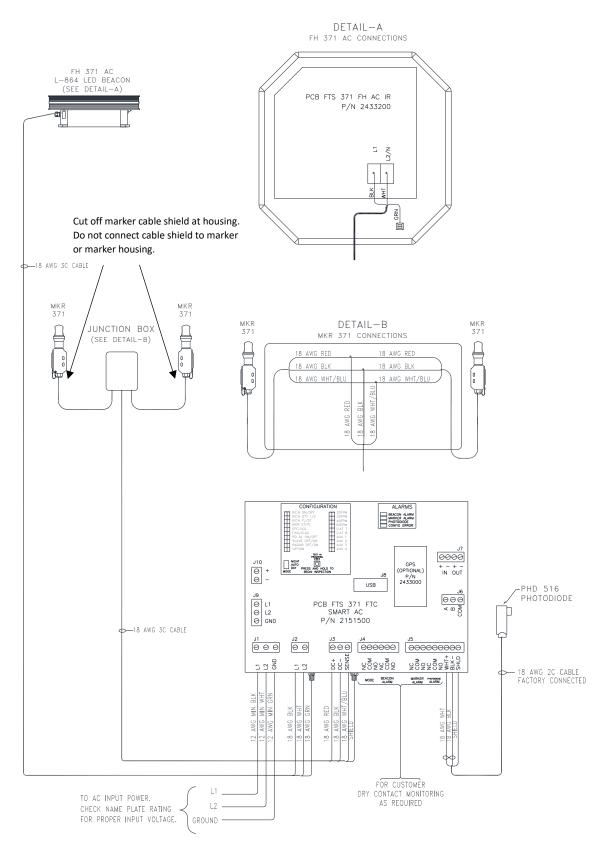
FTS 371 SMART AC Typical FAA Type A1 Installation Wiring
